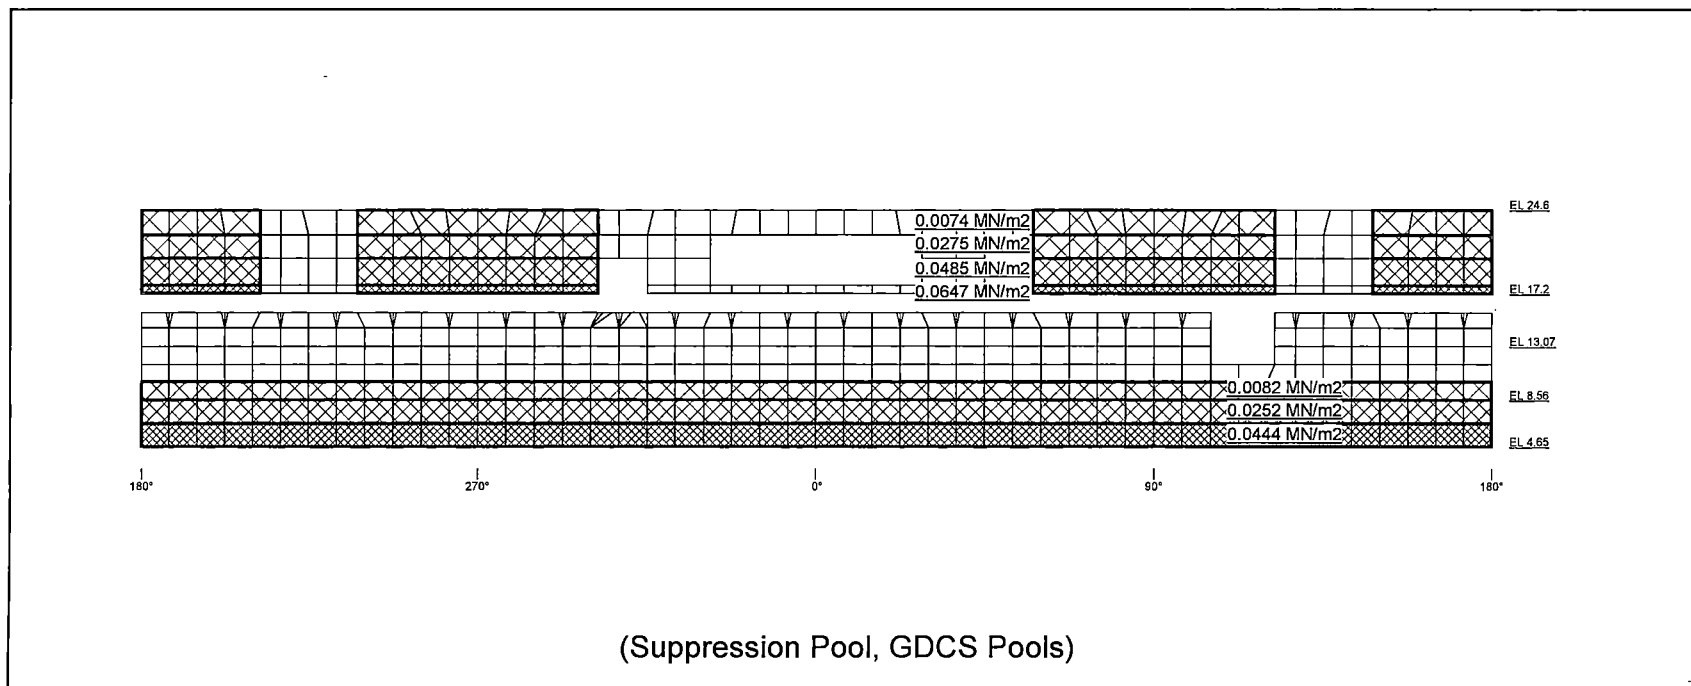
Hydrostatic Loads on the RCCV Wall Liner
